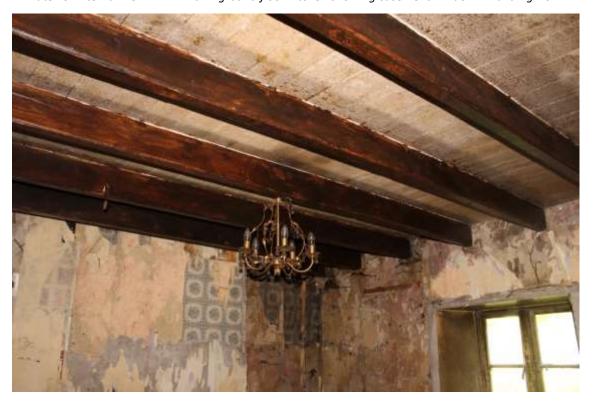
internal view WNW within ground floor kitchen showing ceiling-Building No. 1
